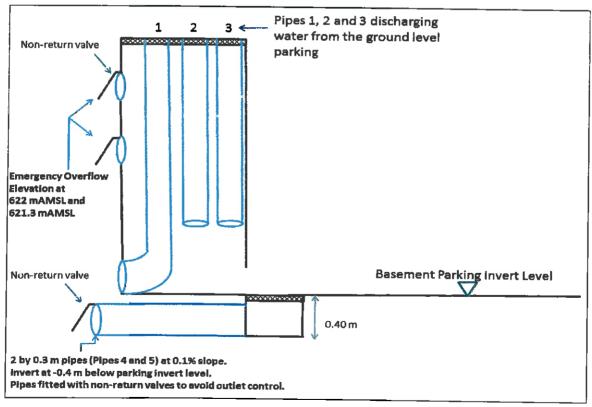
Conceptual Long Section Schematic of the Basement Level Sump, Catch Pit and Stormwater Diversion Pipes.
